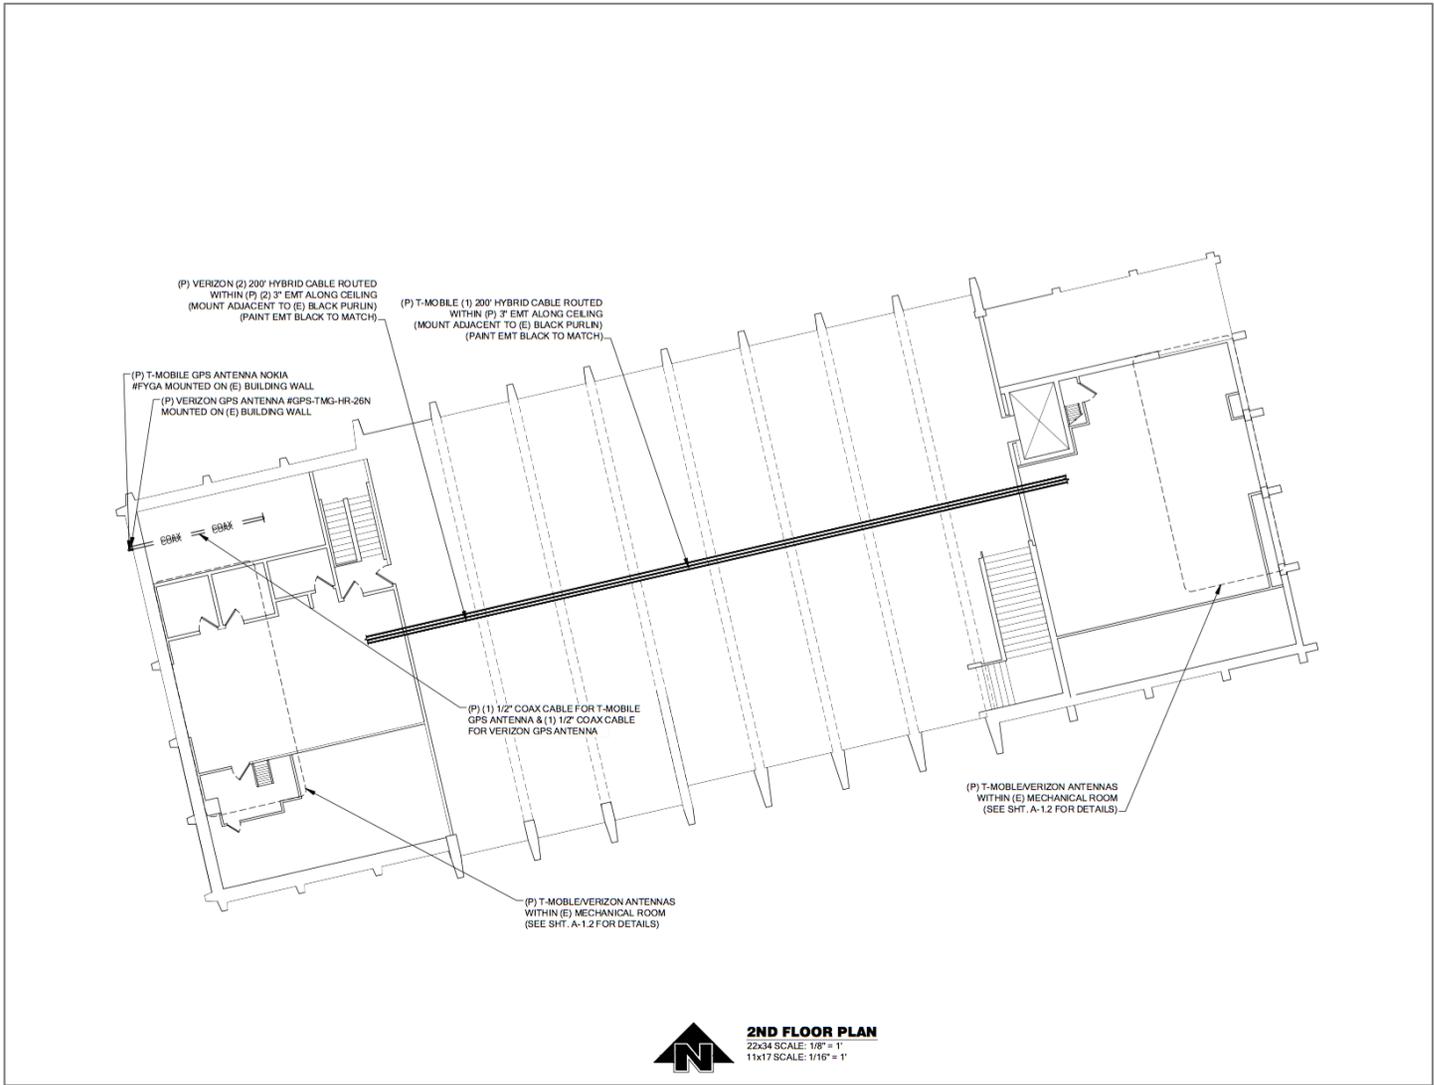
Jackson Visitor Center second floor plan showing mechanical rooms and the “hybrid cable” that connects them.
